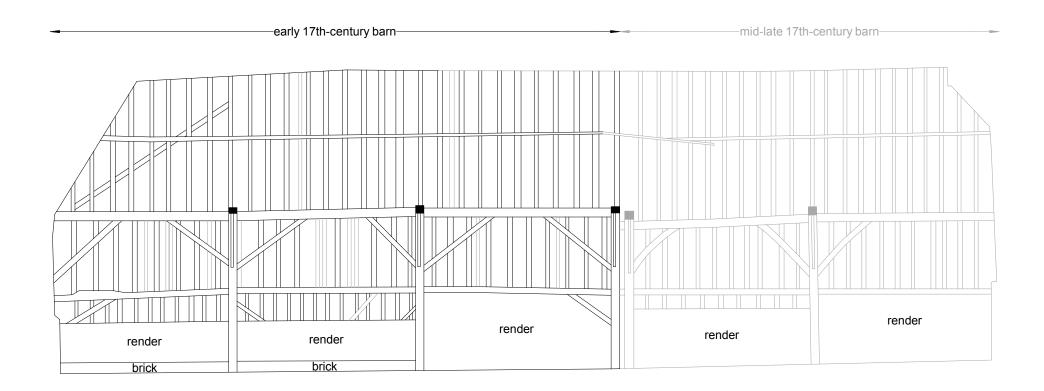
Structure 2 (17th-century aisled barn): timber-framing of north wall, with alterations shown grey.
